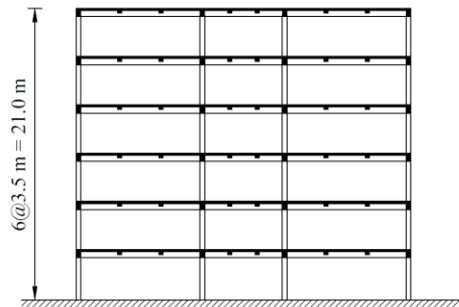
Sectional Elevation for the six-storey reinforced concrete frame office building
